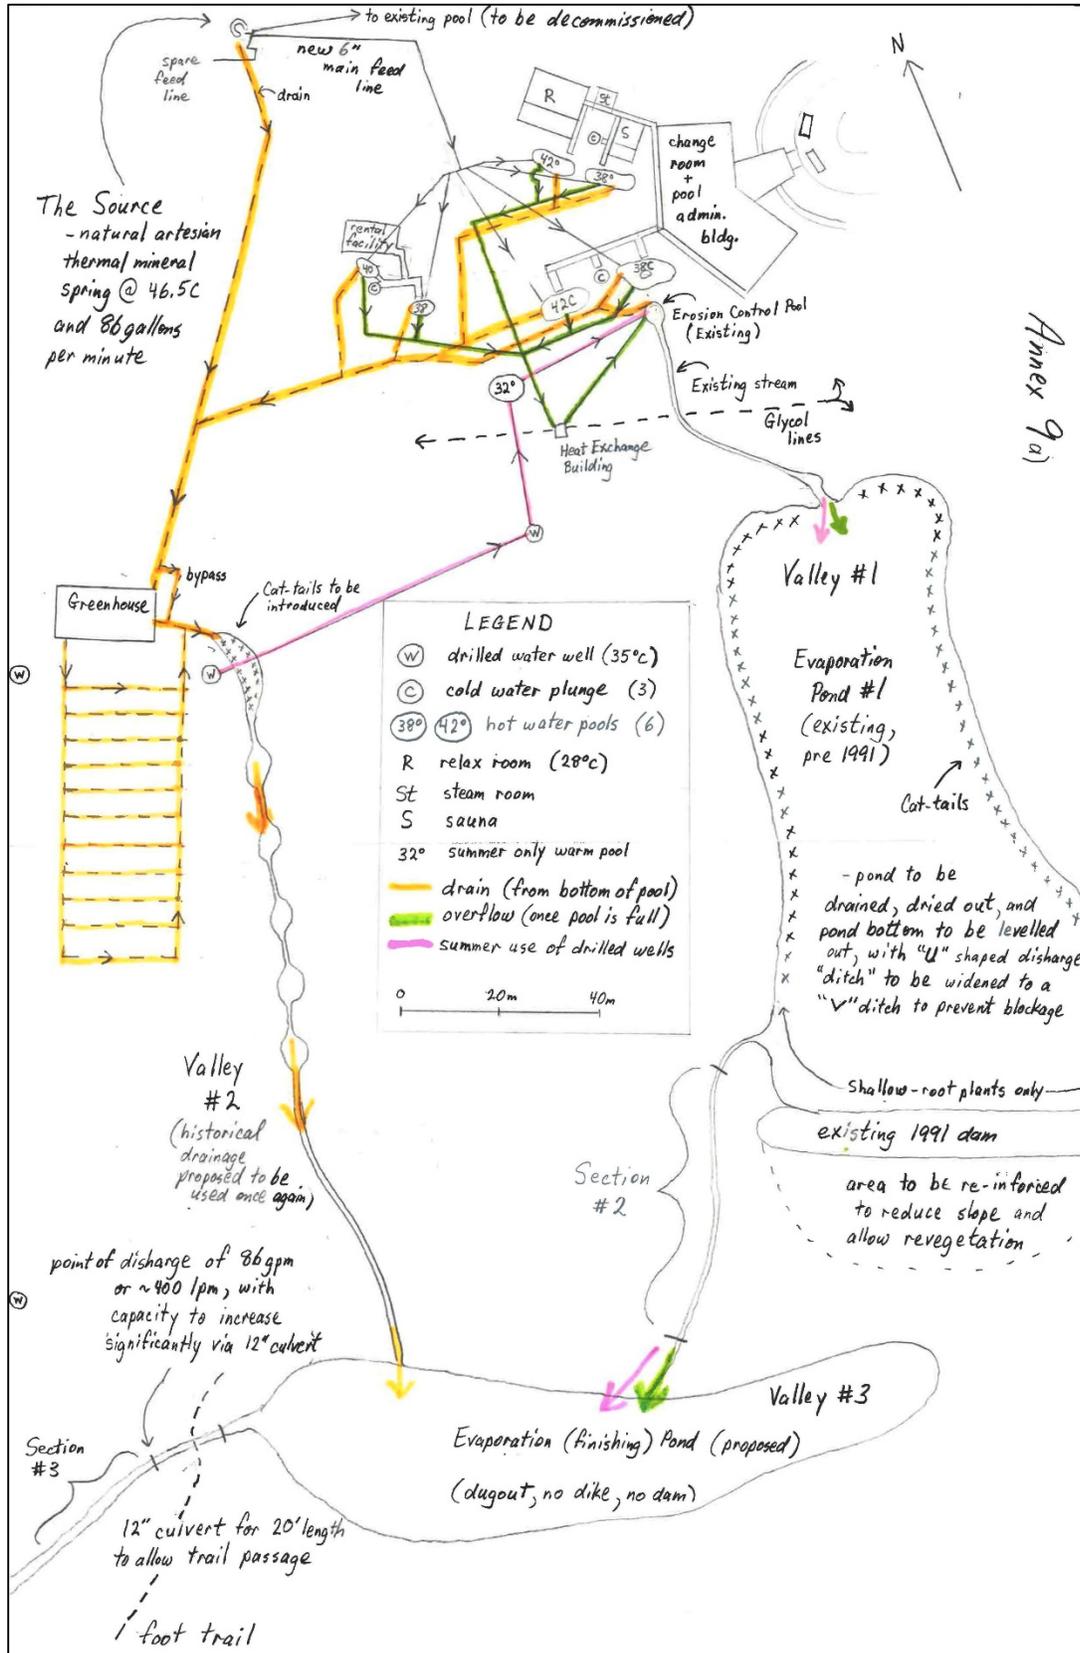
Detailed site layout of the new facility.<sup>6</sup>
